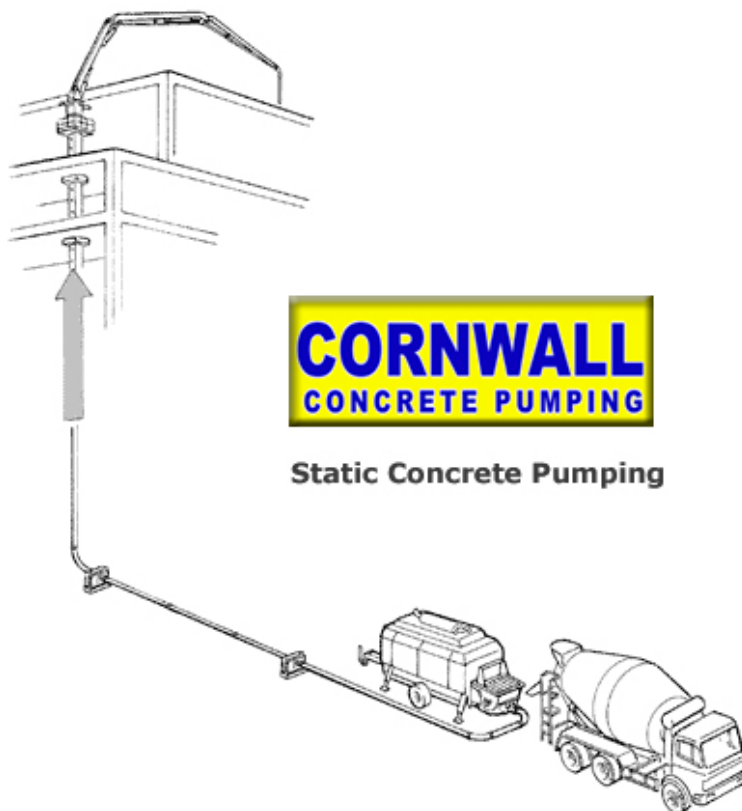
Example of the functioning of a concrete pump with separate pipeline connected to a Tower-Mounted boom. Photo taken from Cornwall Concrete Company.
